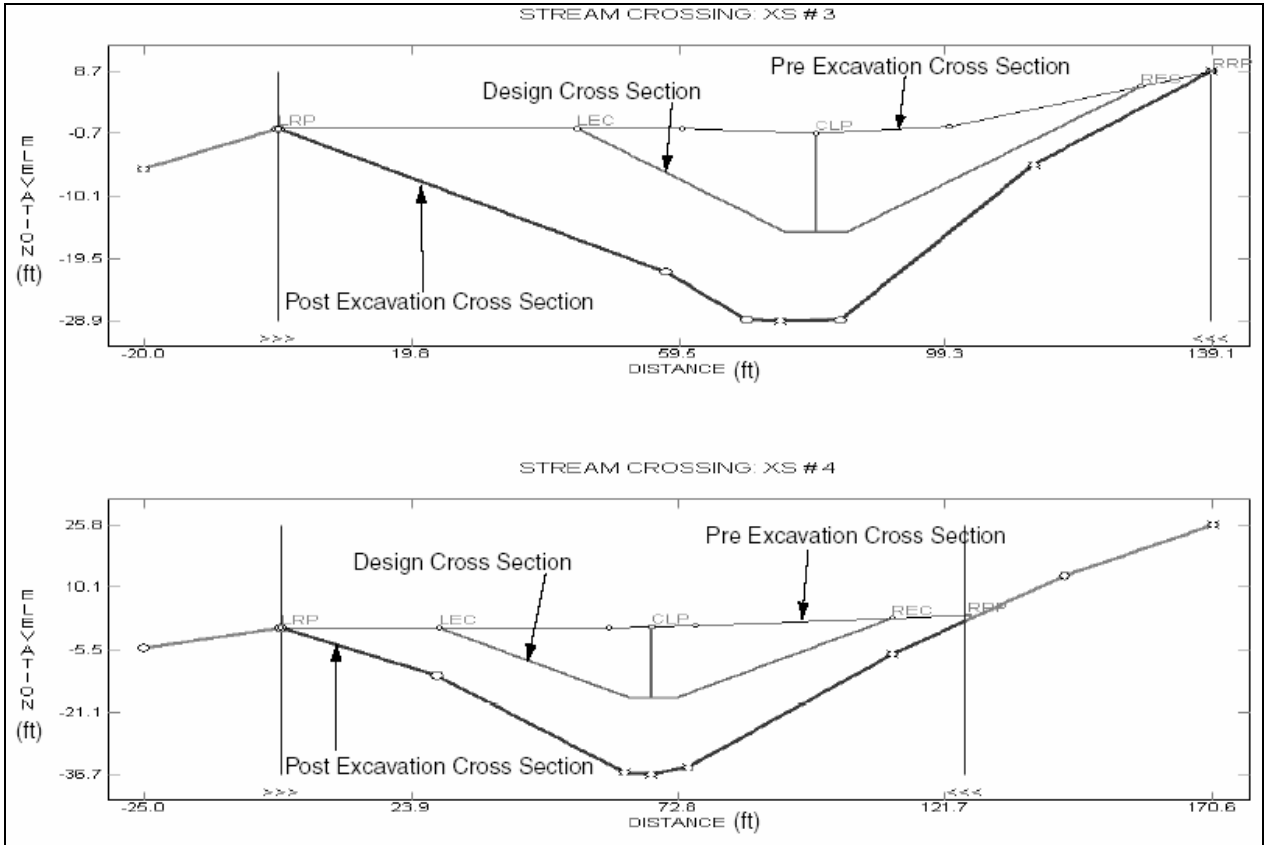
Redwood Creek 1311 Road Site #3 – Stream Crossing Pre & Post Excavation Cross Sections.
